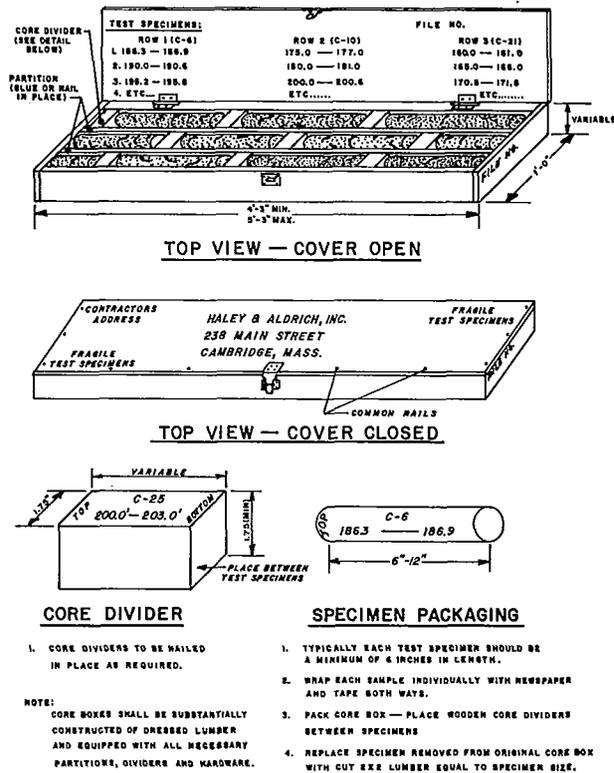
Core Sample Test Specimen Preservation. (Haley & Aldrich, Inc.)
